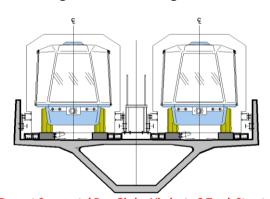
Precast Segmental Box-Girder Viaduct - 2 Track Structure
